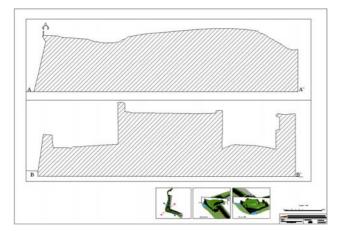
Facade elevation plans, façade orthophotographic elevation plan and cross-sections.
